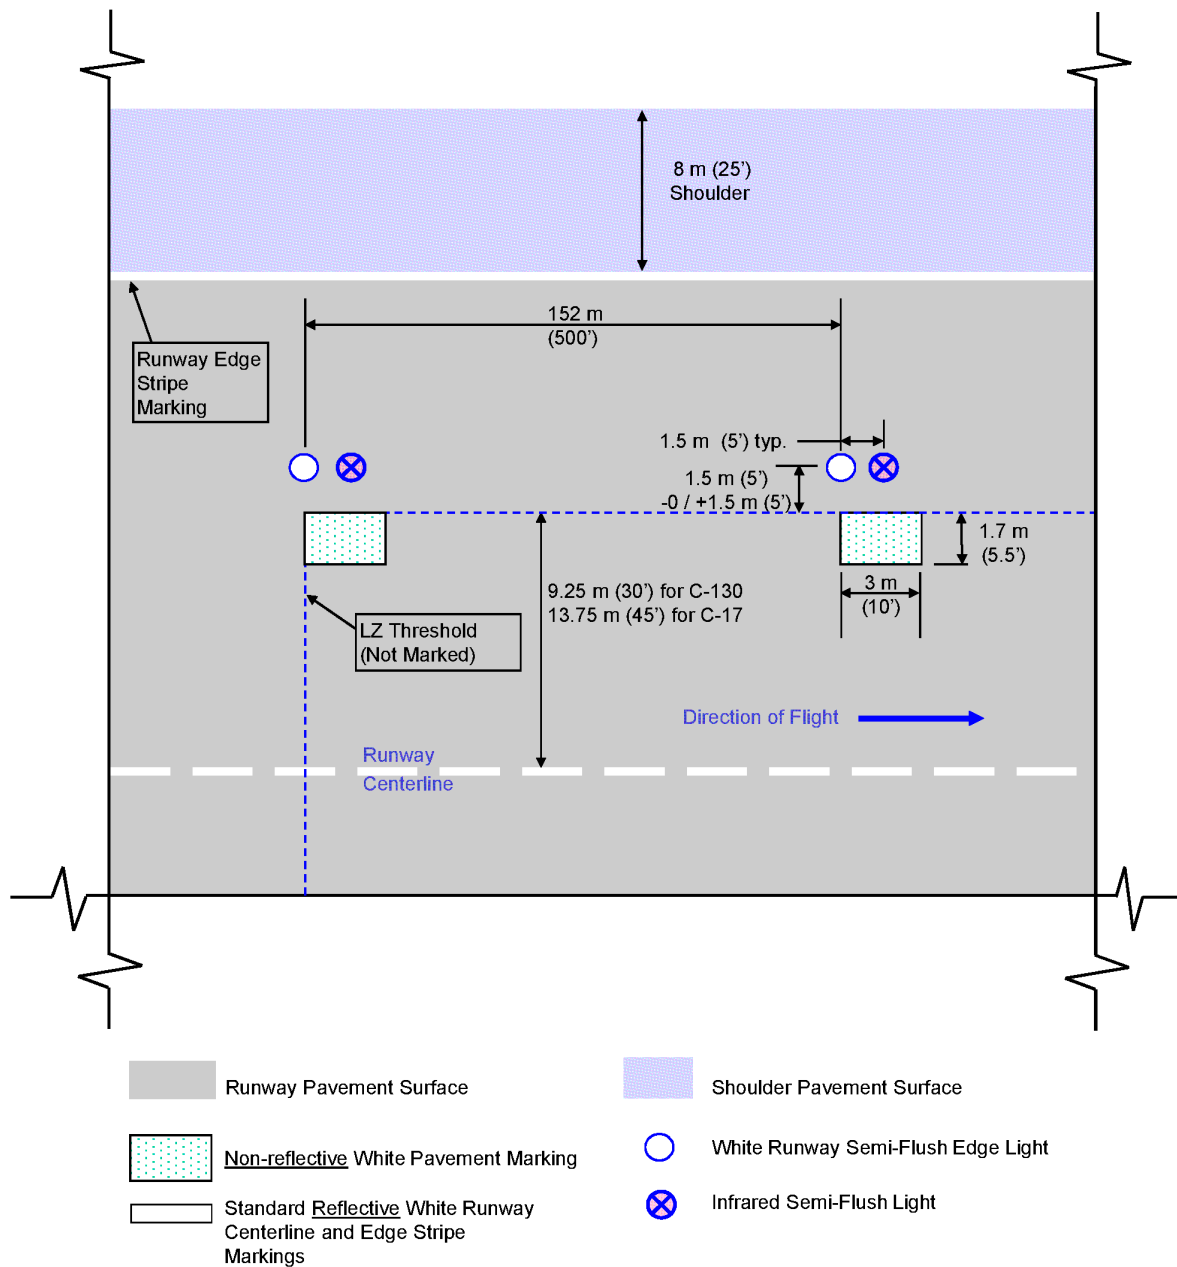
AMP-3 Visible and Infrared Lighting and Marking Layout Detail for LZ Superimposed on Class A Runway
